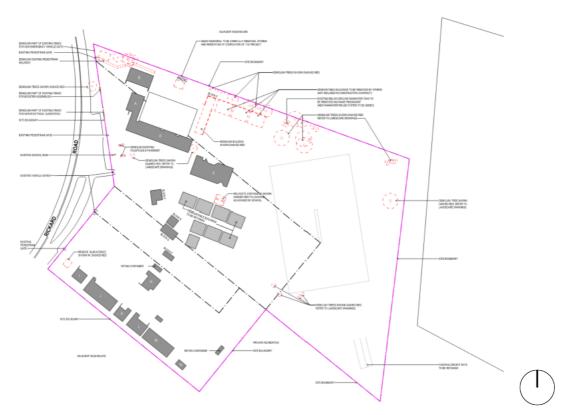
Demolition Plan (Source: Pedavoli Architects)
